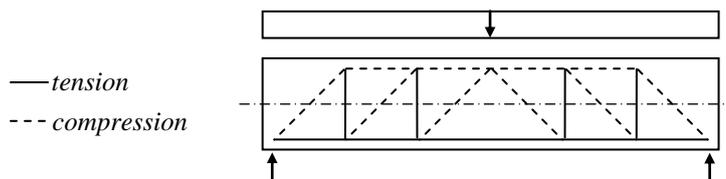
Truss model of a cracked reinforced concrete beam subjected to a uniformly distributed load.
